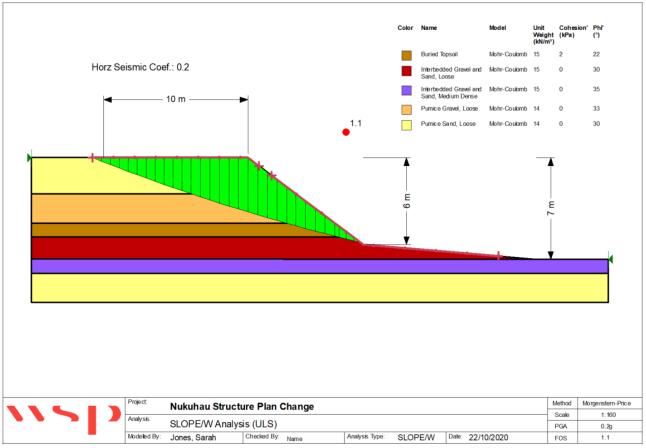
Slope Stability Model at Brentwood Gully Extension, ULS, failure 10m back from slope edge
